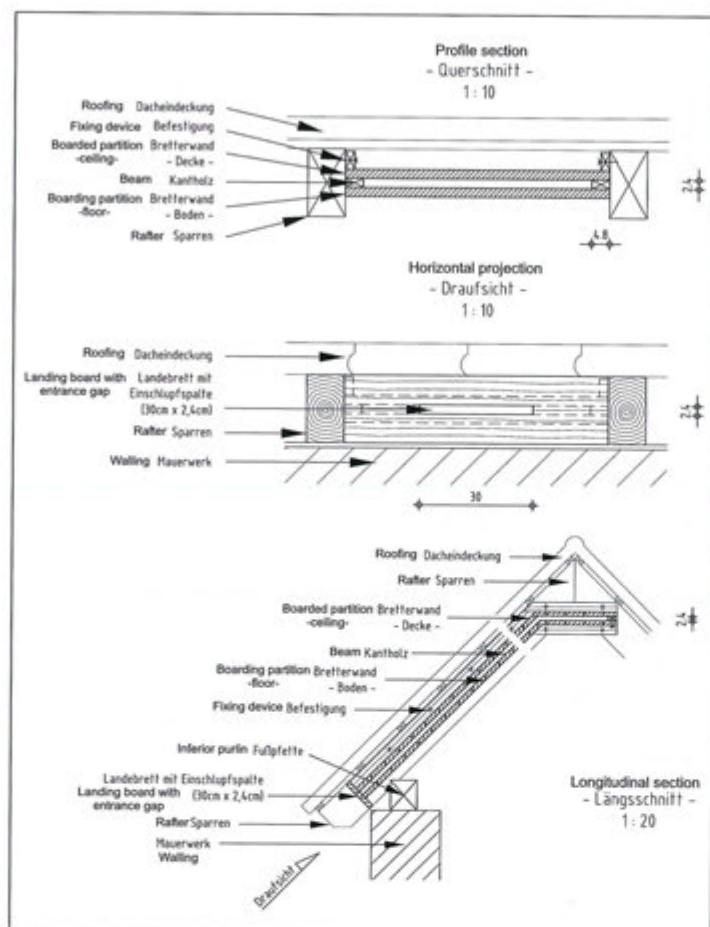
Sketch of crevice roost under roofing with access from outside in cross-section, horizontal projection and longitudinal section.
